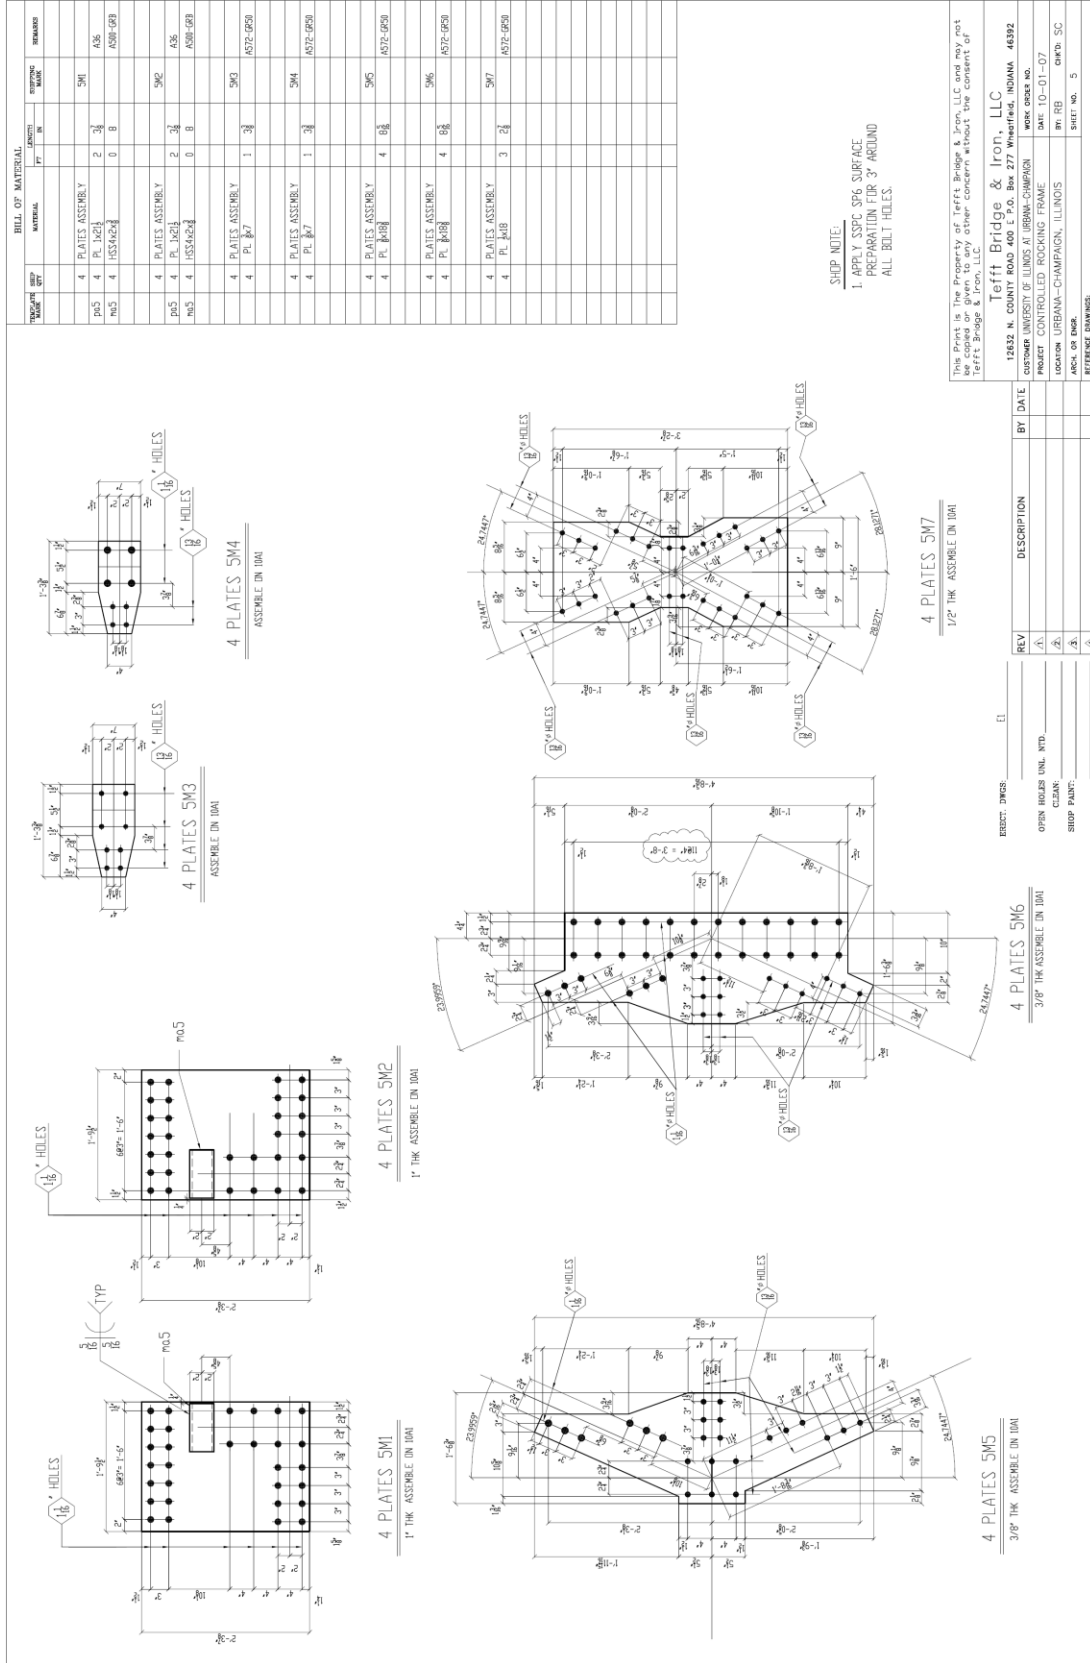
Shop Drawing for Fabrication – Gusset Plates
